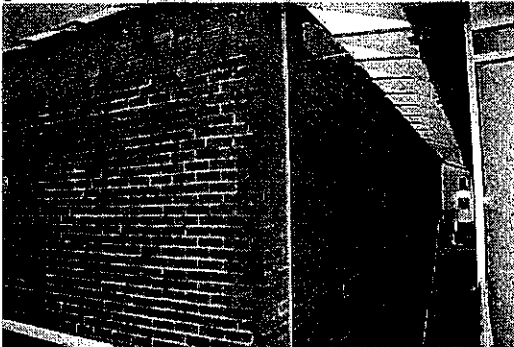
Exterior, Call Room, view of north and east elevations now largely enclosed by the new University of Ballarat building.
